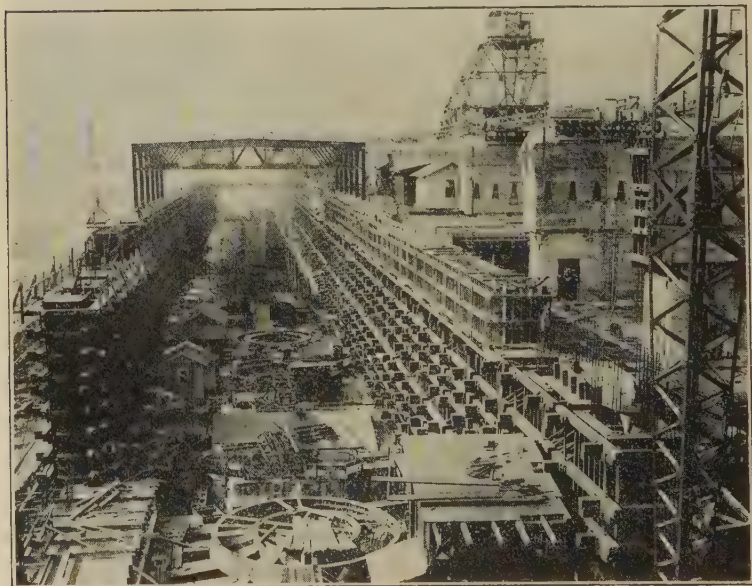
POWER HOUSE SUPERSTRUCTURE UNDER CONSTRUCTION.
